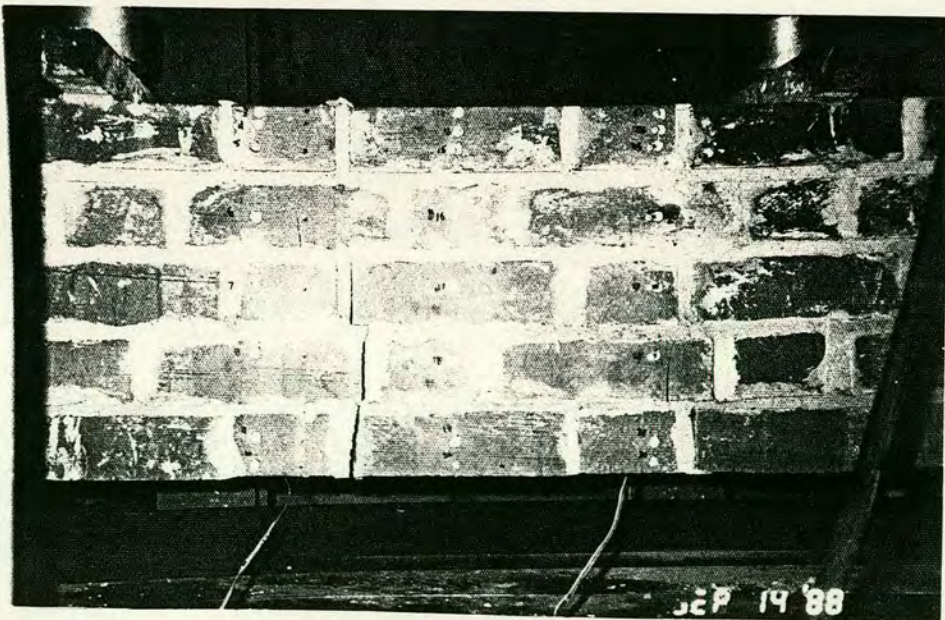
Typical failure mode and crack pattern for Flemish bond beams (B1-B2)
